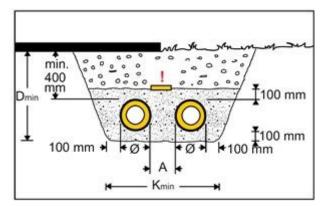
Dimensions of the trench excavation of the heating and cooling network of the local building
